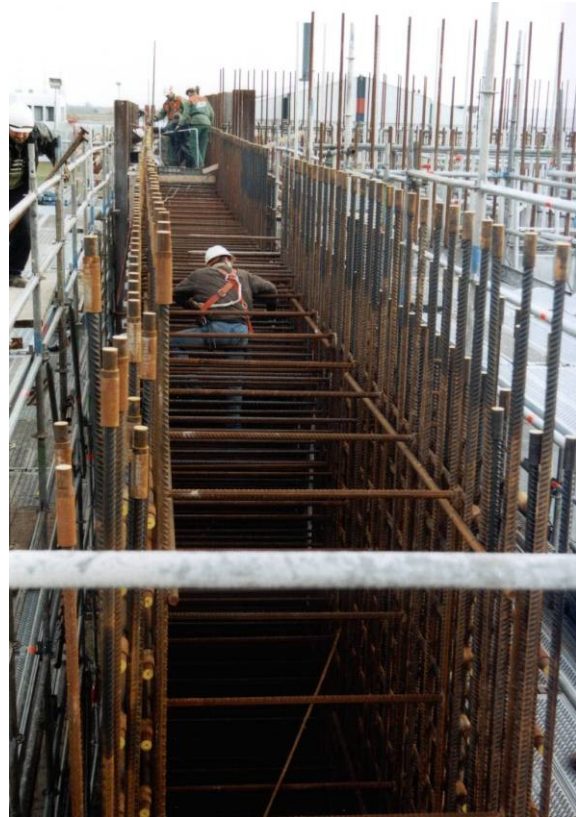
Worker in the concrete at work in a 1,7 meter thick outer wall
